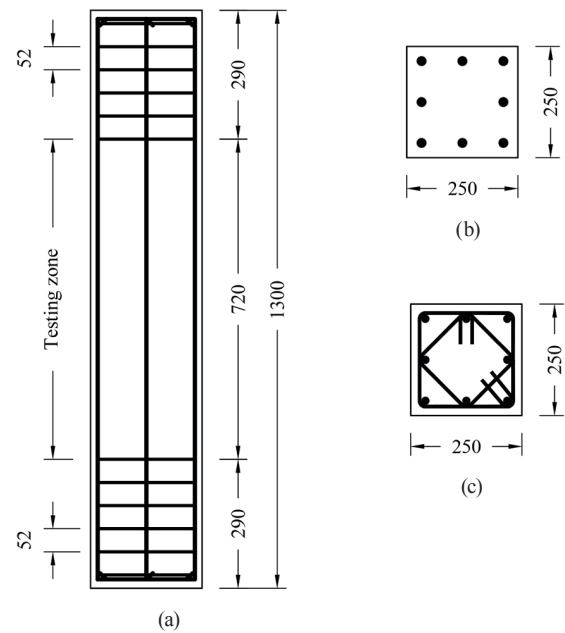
Dimension and reinforcement details for control column C: (a) the longitudinal section; (b) cross-section at test zone; (c) cross section at upper and lower stub regions
